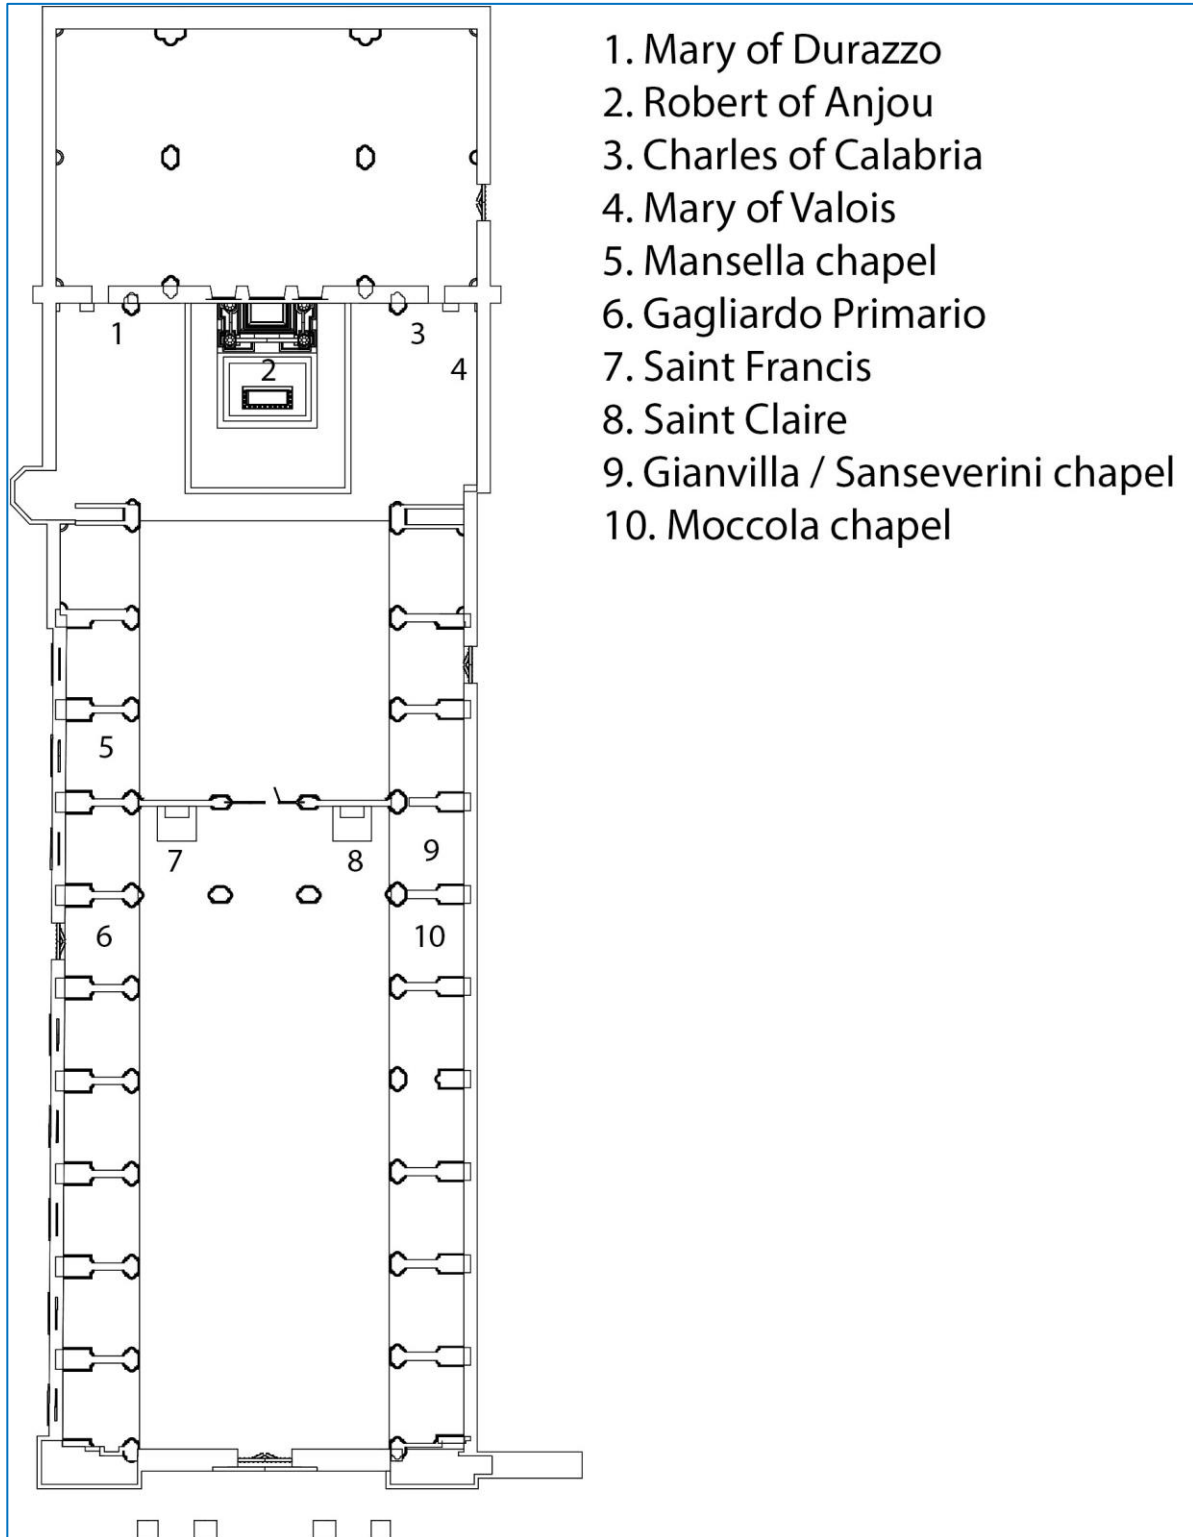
Santa Chiara, Naples, church plan showing the location of chapels, tombs and altars (adapted from Alessandra Rullo). Photo: author.
